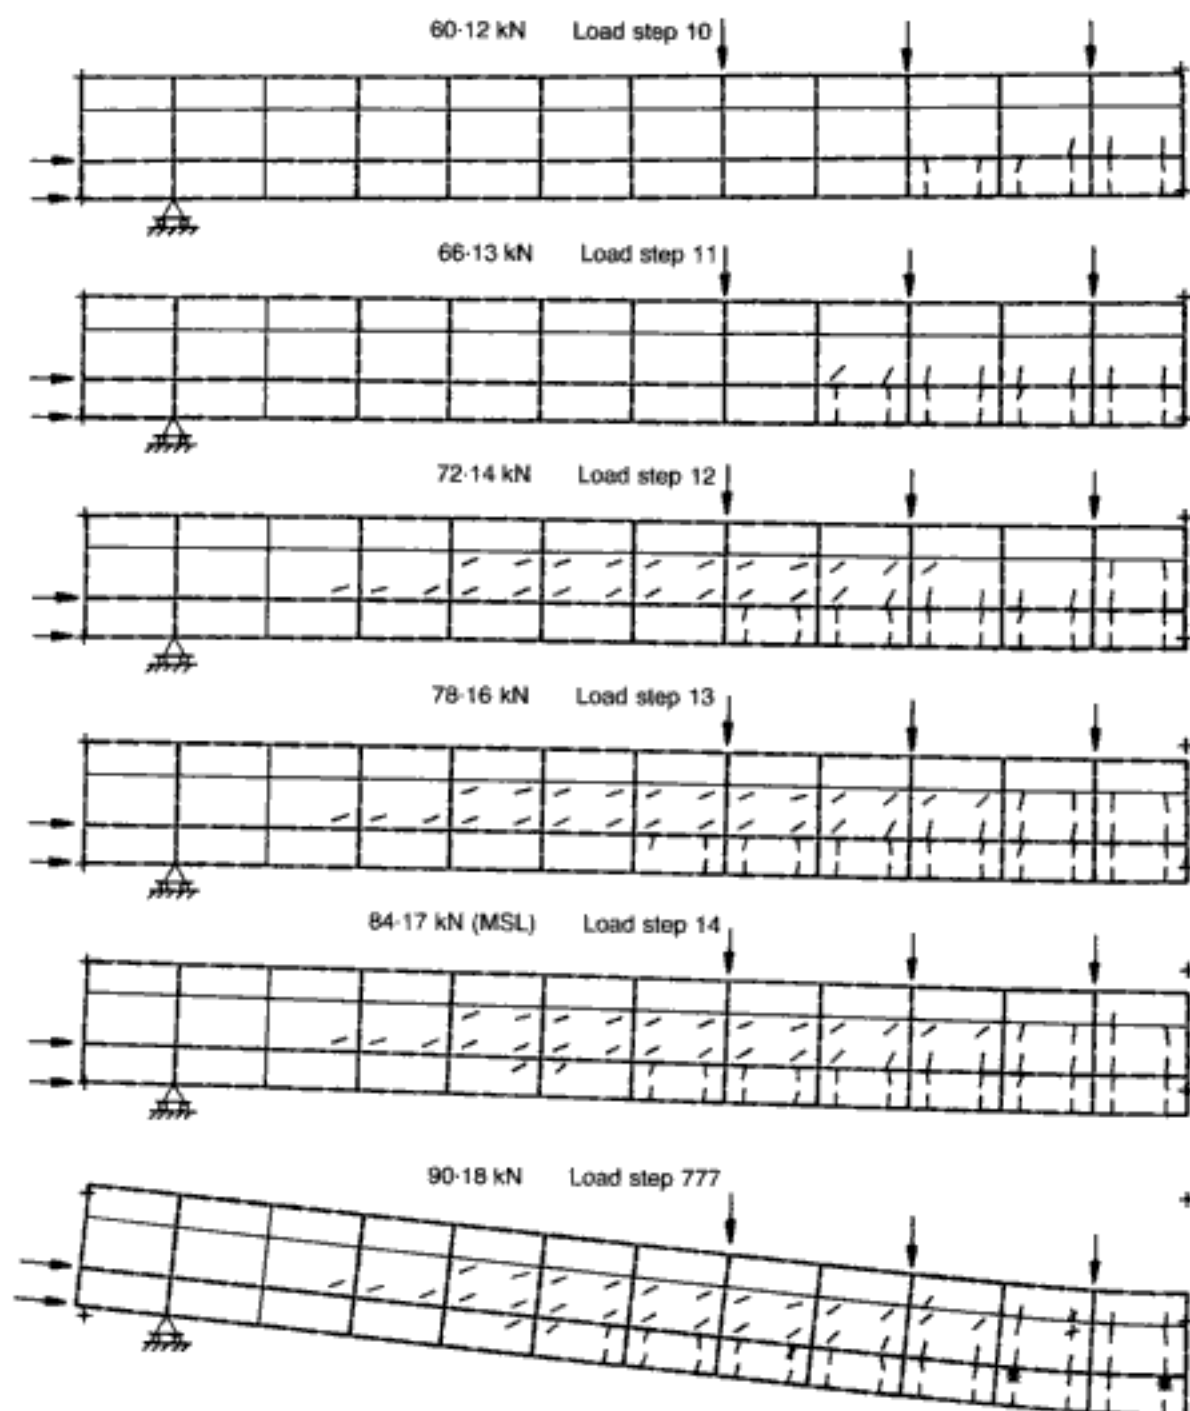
Beam PCB6. Crack pattern at failure¹⁸¹
